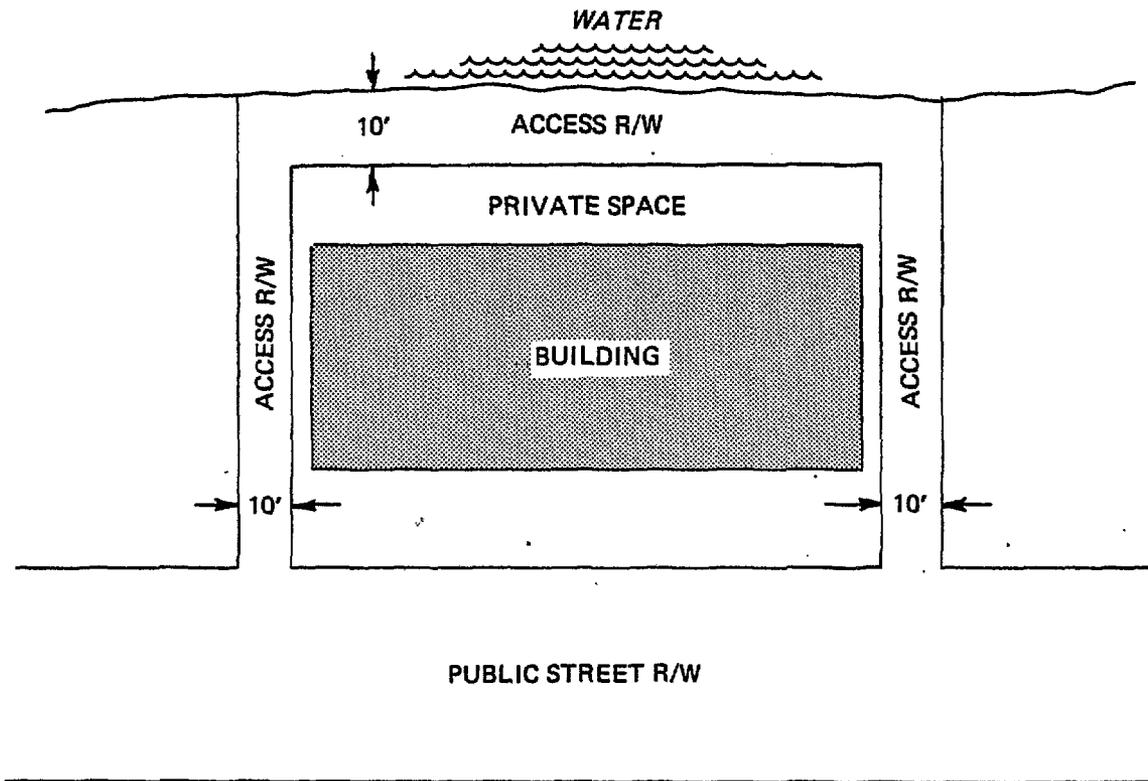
Minimum dimensions for a public access around and behind a typical multi-family building.
